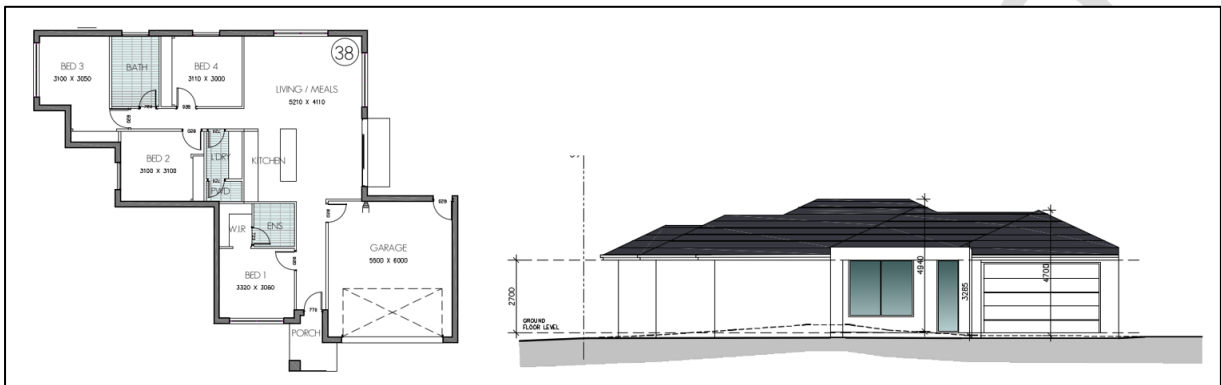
(above): Layout E Unit floor plan (left) and front elevation (right). Source: Application documents.
